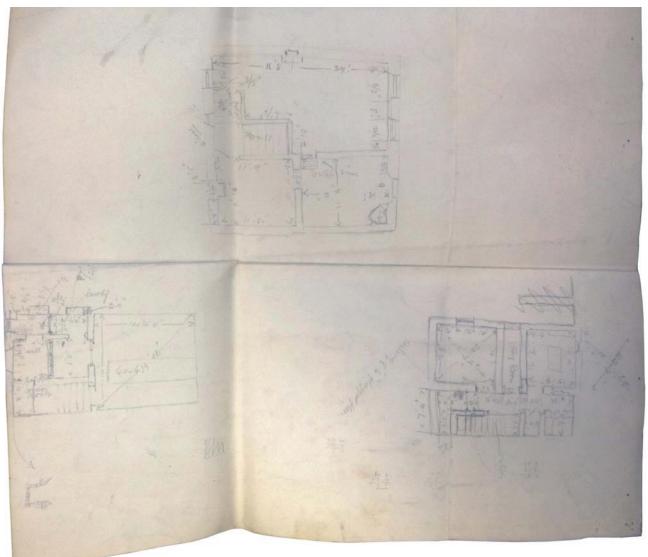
Undated sketch plans of *c*1901 (CAC(B) Z/1028/2 1901-1904)
